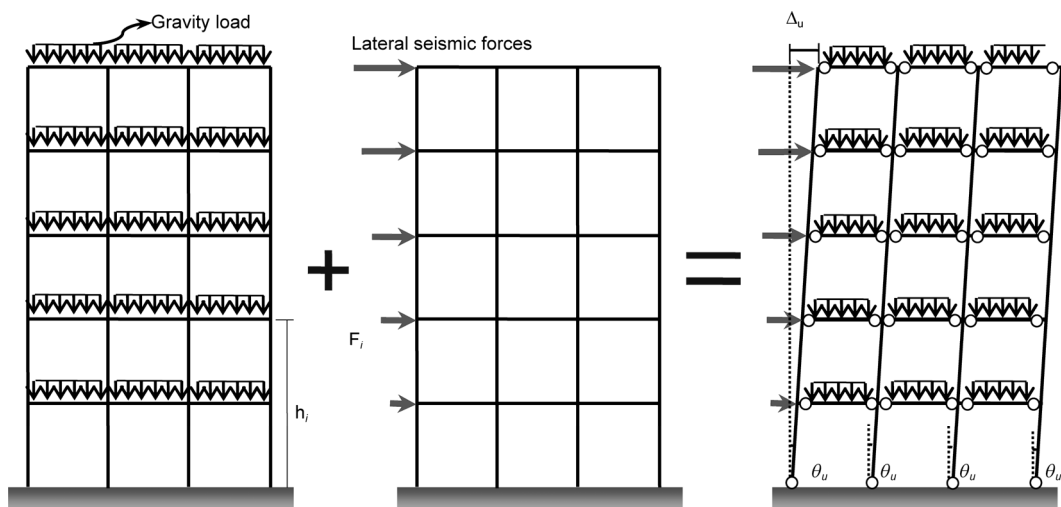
Formation of global failure mechanism of frame structures under gravity load and lateral seismic loads.
